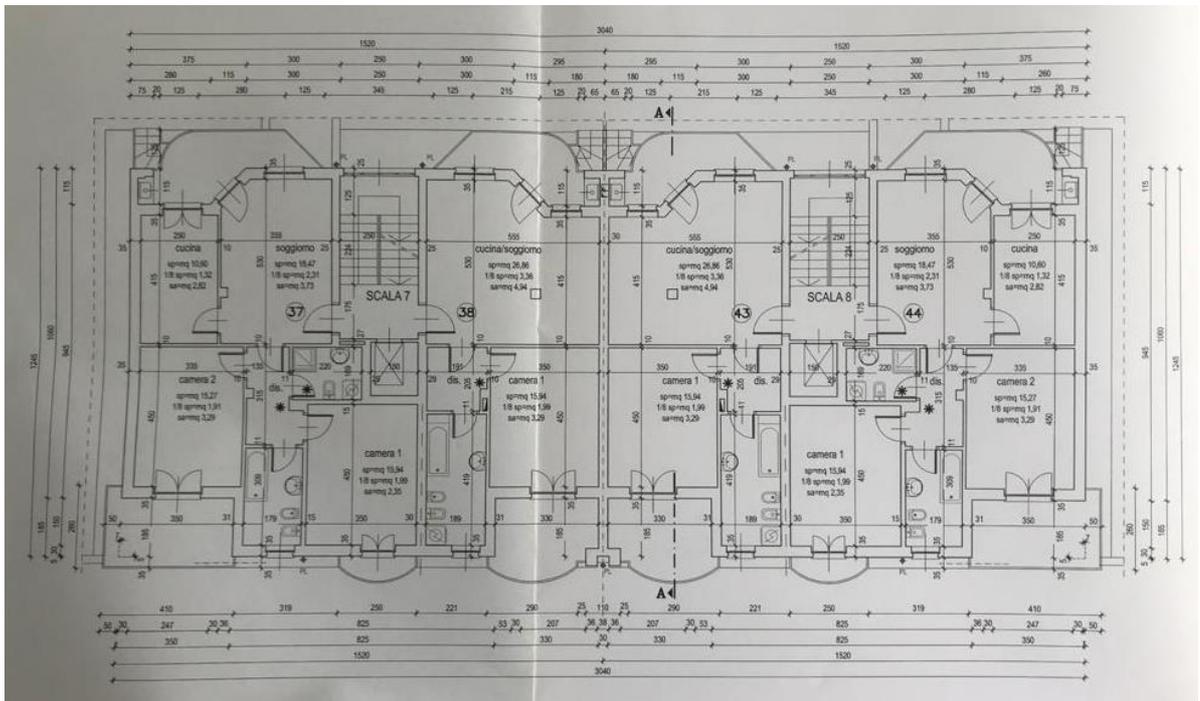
Ground Floor Plan (Via S. Francesco da Paola 5)
